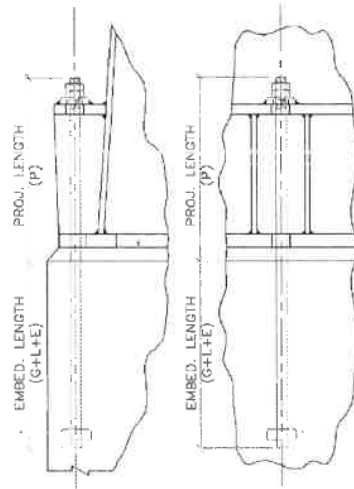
ANCHOR BOLT WITH ANCHOR CHAIR
